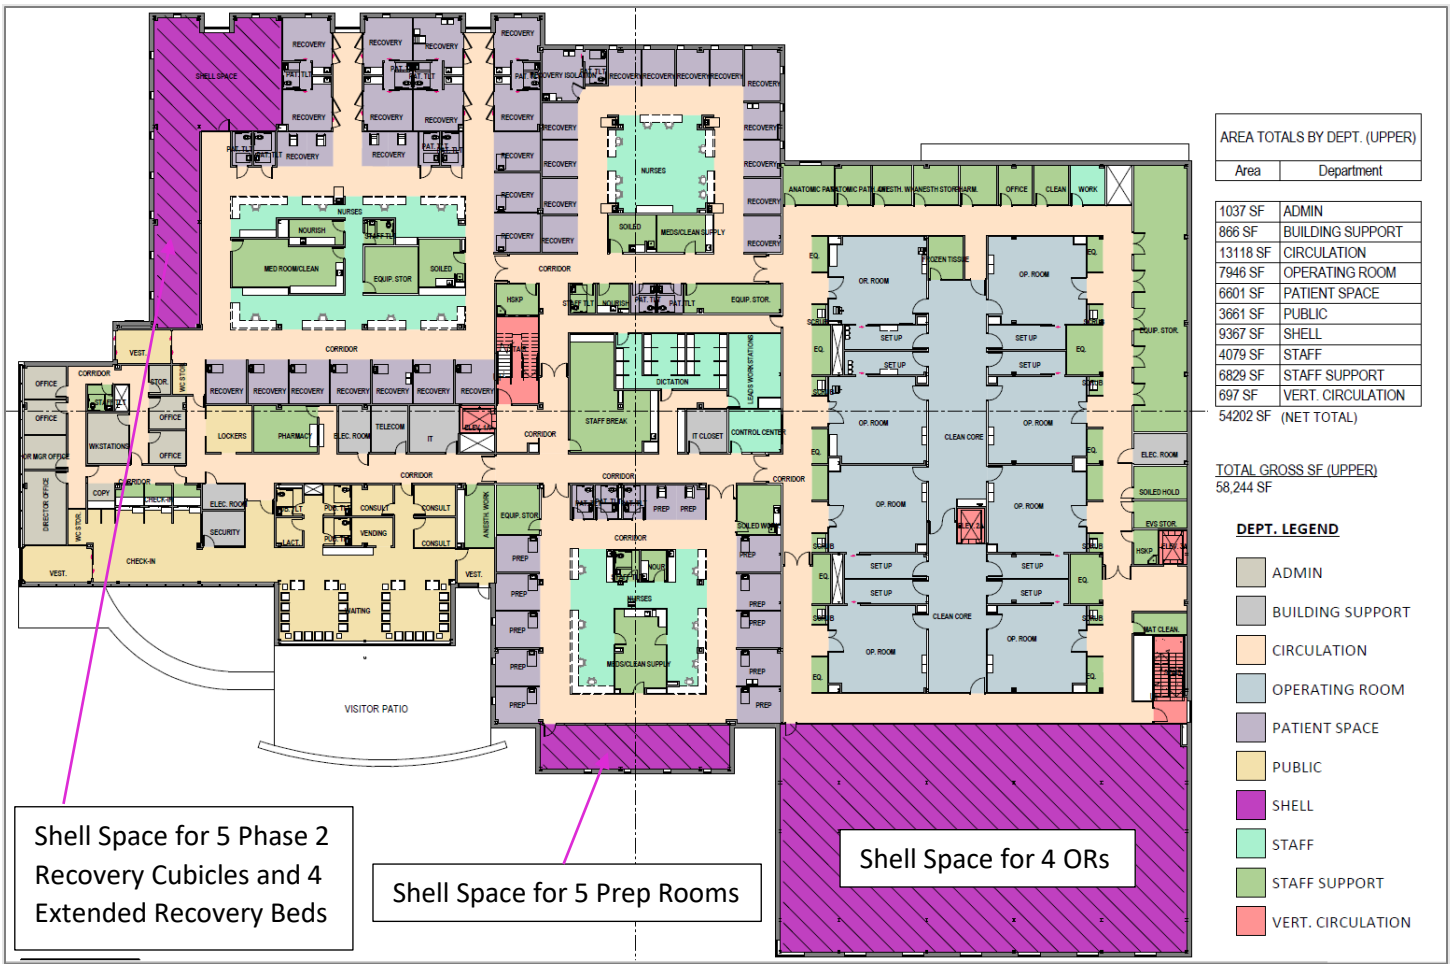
OSC Floor Plan: Ground Floor Level.
